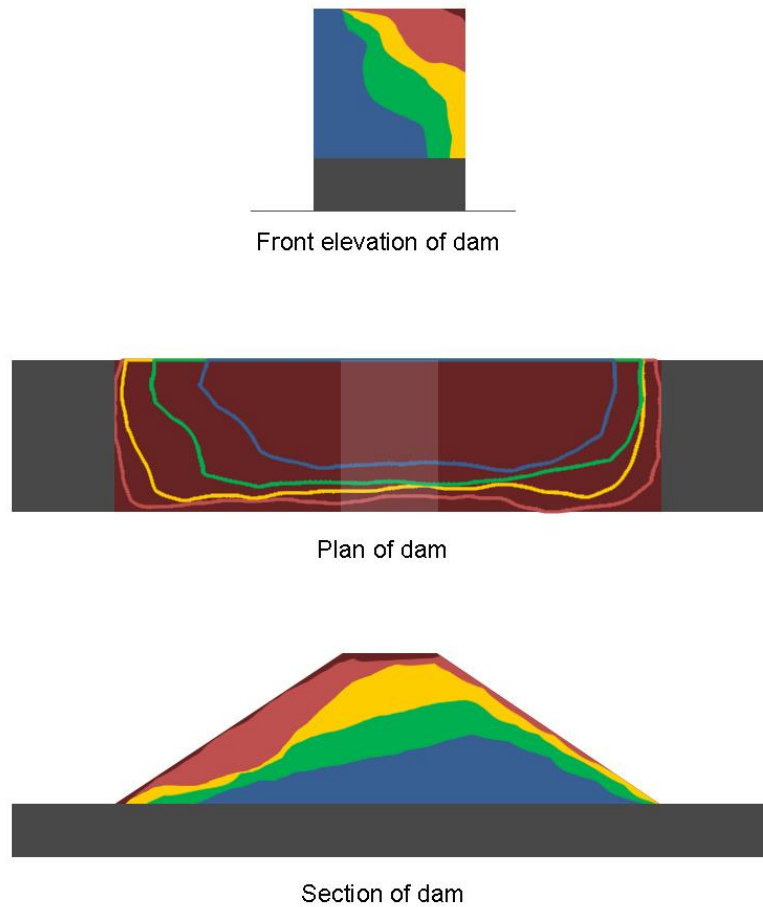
Front elevation, plan, and a section of the breach dam stages.
